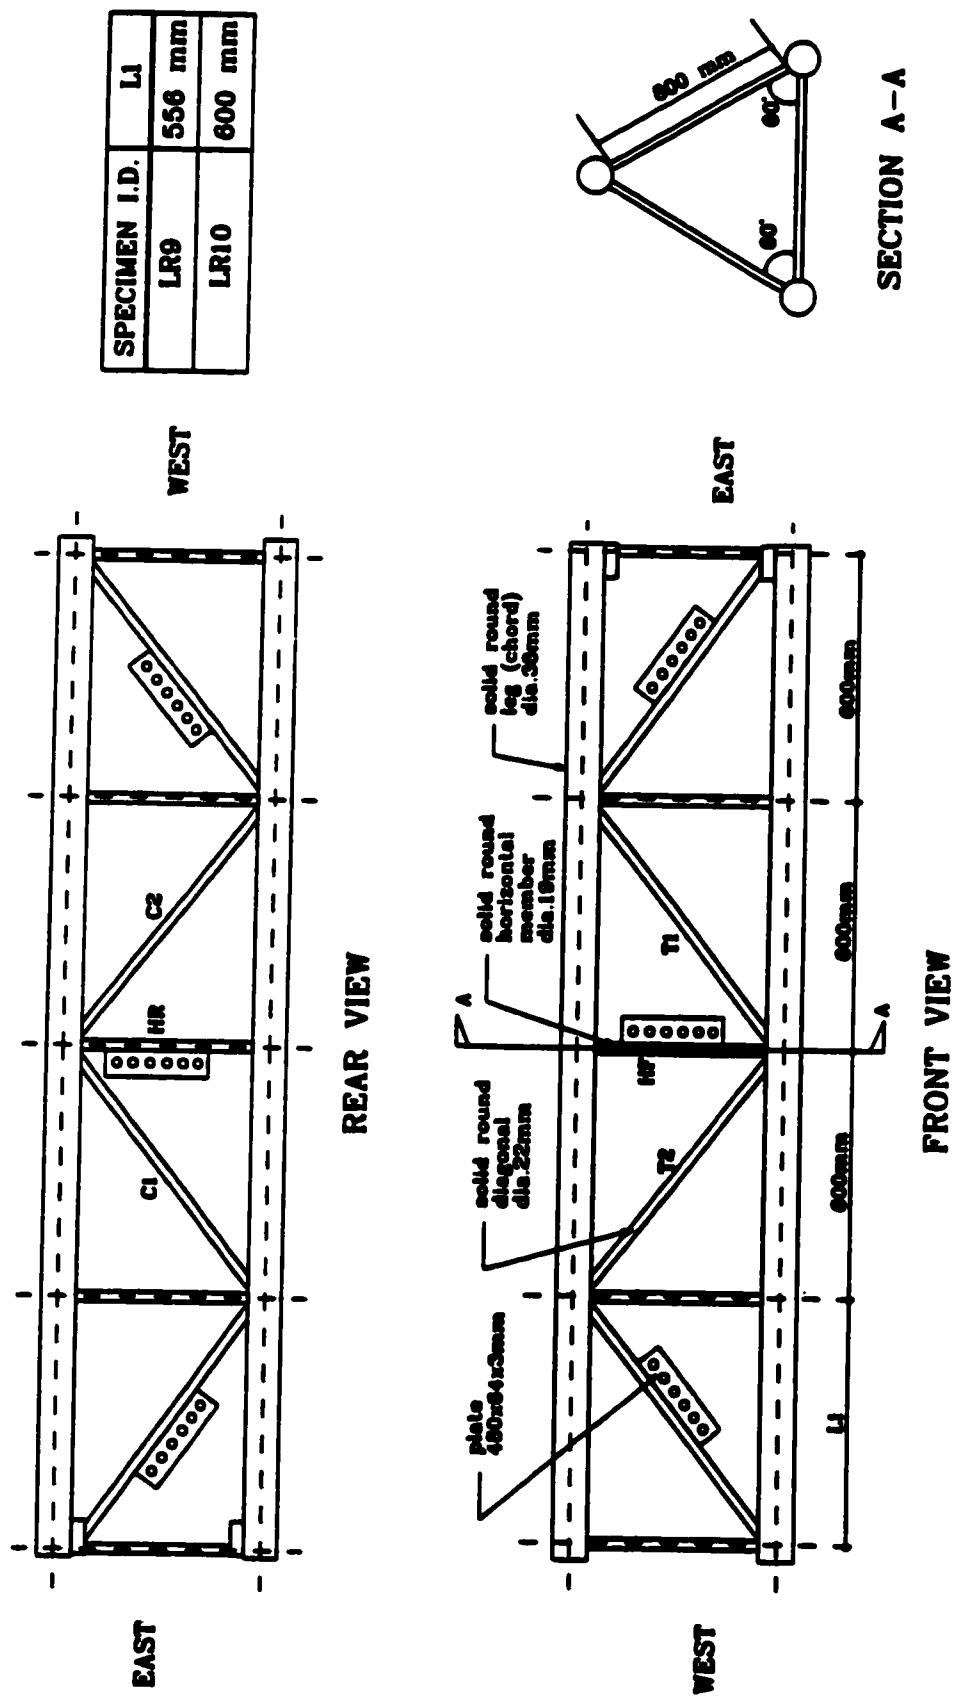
Dimensions of Specimens LR9 and LR10
